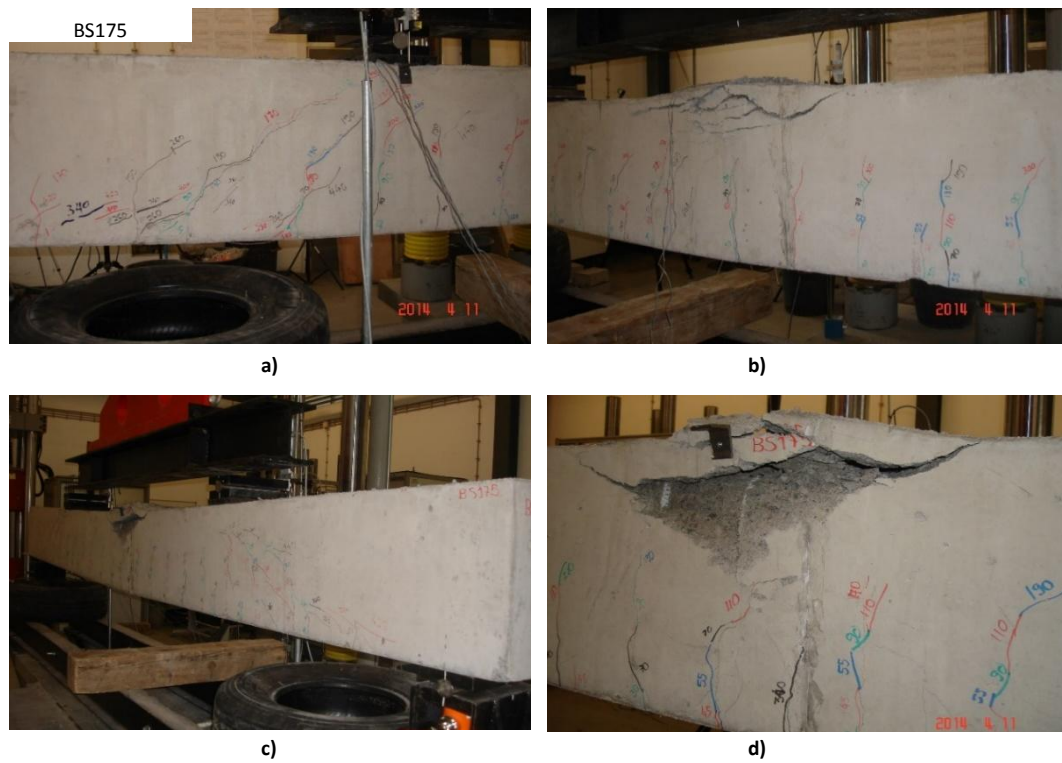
BS175 beam failure: a) view of shear cracks at failure; b) mid-span; c) overall view; d) top of mid-span
